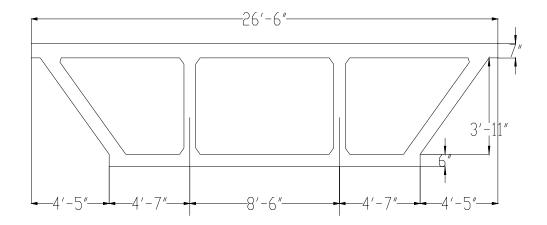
Cross Section of 1RWD Off-Ramp Bridge Deck (reinforcement not shown, drawing not to scale)
